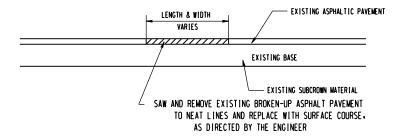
DETAILS OF REPAIRING EXISTING PAVEMENT PRIOR
